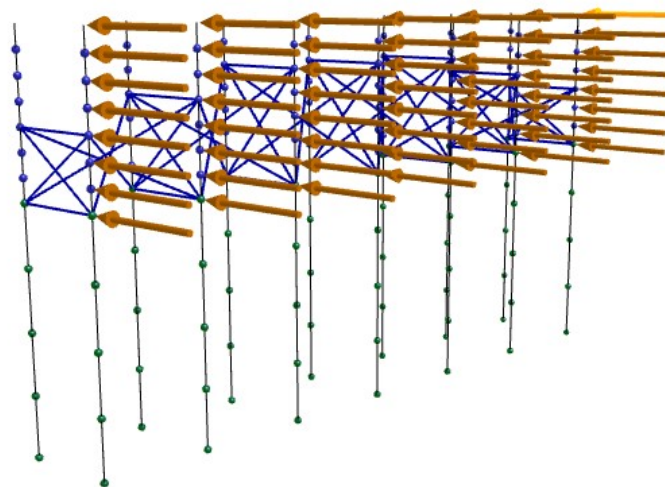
Breakwall thin element model with distributed forces from hydrodynamic loading on post and porous wall.
